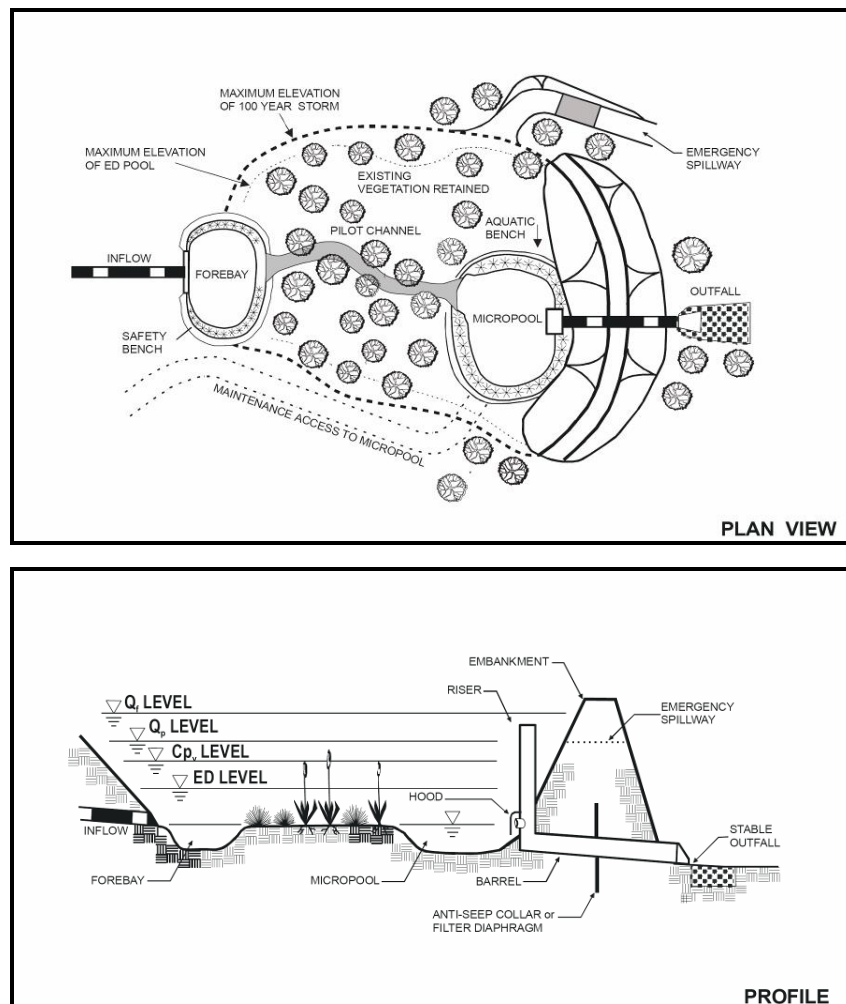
New Stormwater Pond ("Micropool" Extended Detention Pond shown)
